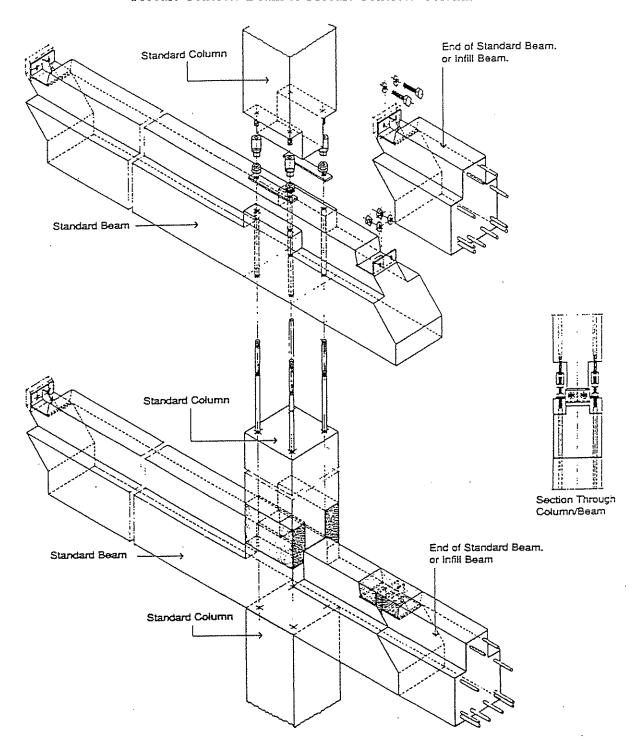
Beam-to-column connection and bolted beam-to-beam mechanical connection [adapted from Contiframe Structures 1992].
